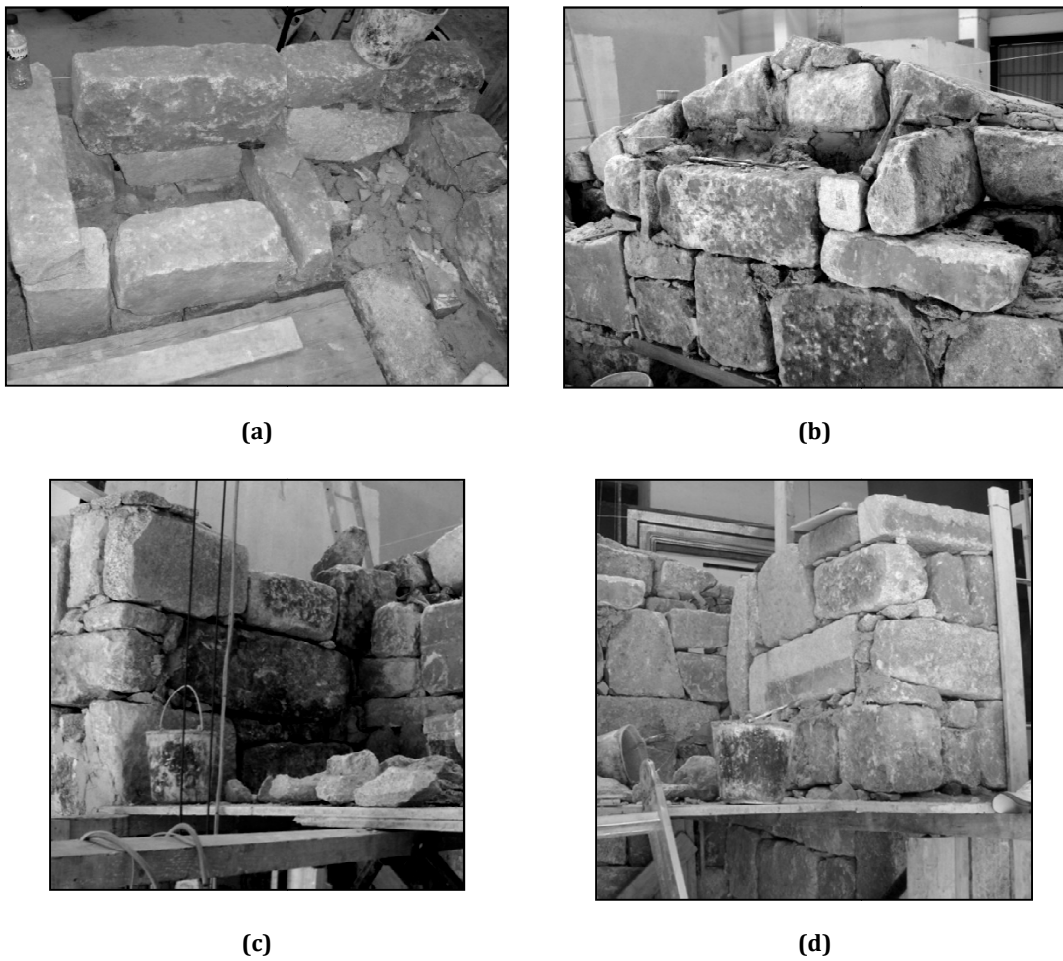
Details of the construction phase: a) through stones at the façade; b) through stones placed at gable; interlocking between façade and: c) south wall; d) north wall
